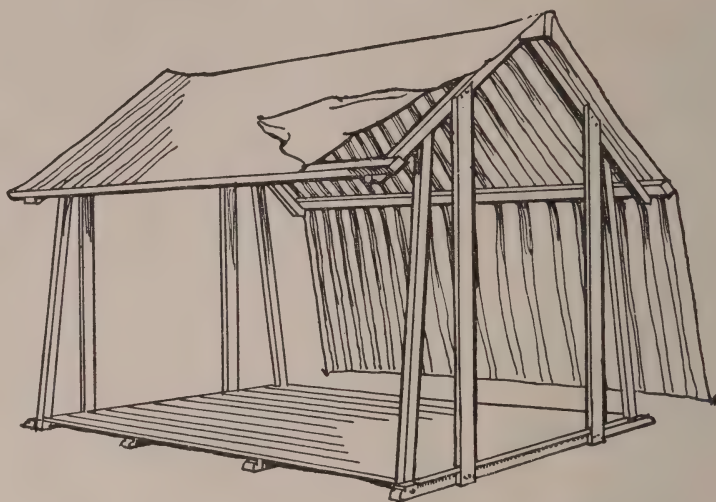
Portable Summerhouse Tent showing Construction of Framework
